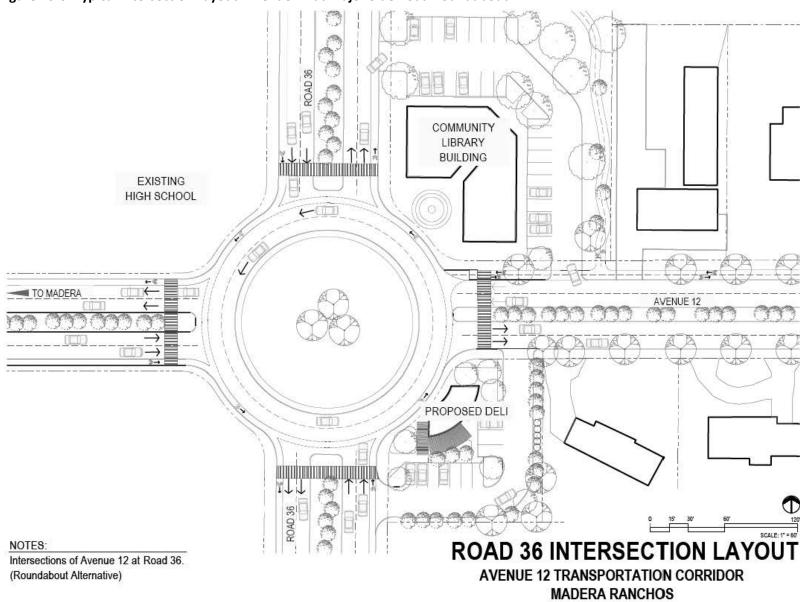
Typical Intersection Layout: Avenue 12 at Major Side Road Roundabout
